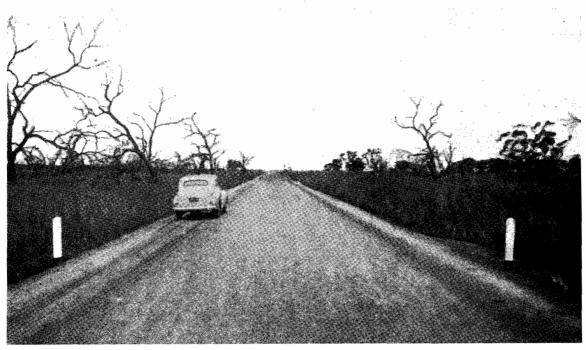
Murray Valley Highway. Newly-sealed sand-clay pavement at Murphy's Swamp, 10·8 miles north-west of Echuca.
